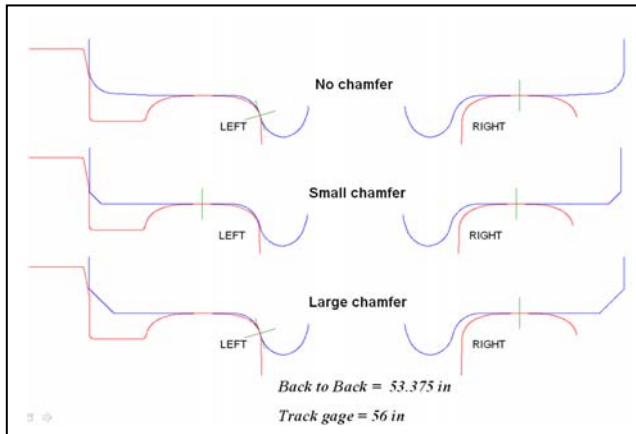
Wheel/ Guard Contact in Entry Flare for Narrow Track Gage and Wide Wheelset Spacing at Cross Section A
